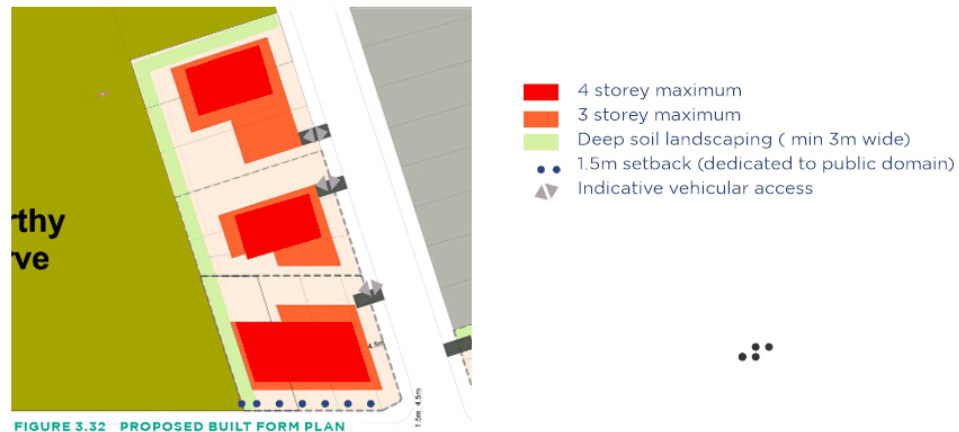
PROPOSED BUILT FORM PLAN
